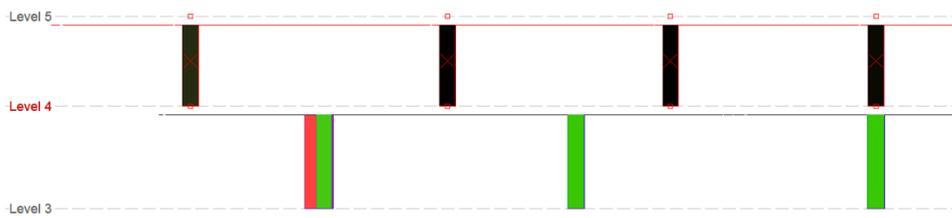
Select Top Columns in Single-Level Mode, Elevation View
